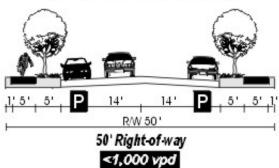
NEIGHBORHOOD ROUTE SAMPLE STREET CROSS SECTIONS
